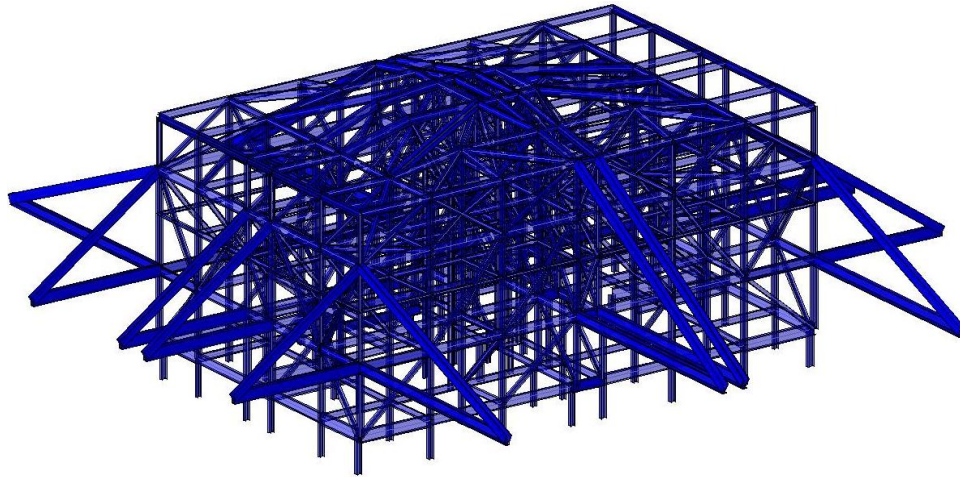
Computer model of hat truss framing at the roof level of the WTC towers [1].
